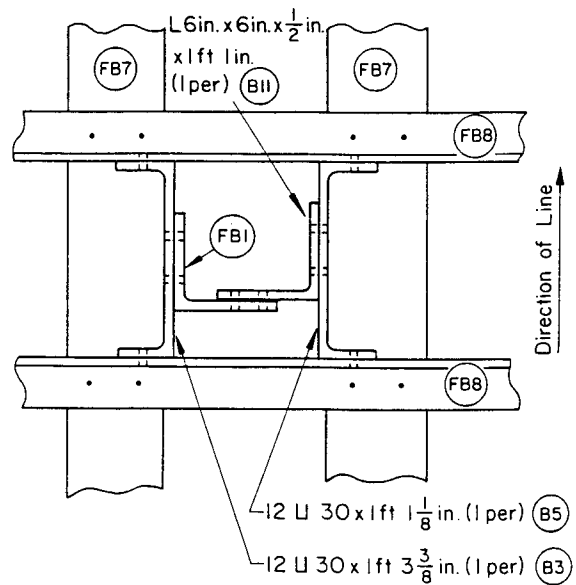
shows details of the galvanized steel members used for the No. 84 grillages. Figure 2-5a shows the stub and stabilizing sections. The stubs were 6 in. x 6 in. x 5/8 in. (152 x 152 x 15.9 mm) angle sections having a total length of 10.2 ft (3.11 m). Prior to field testing, approximately 1.2 ft (0.4 m) of the stub was exposed above the ground line. Near the top of the stub, two 5 in. x 3-1/2 in. x 5/16 in. x 4 ft (127 mm x 89 mm x 7.9 mm x 1.22 m) stabilizing angles were attached. The grillage base sections, shown in Figure 2-5b, had plan dimensions of 7 ft x 7 ft (2.1 x 2.1 m), with a nominal embedment of 9.5 ft (2.9 m). The connection arrangement is shown in Figure 2-5c. Depending on the
